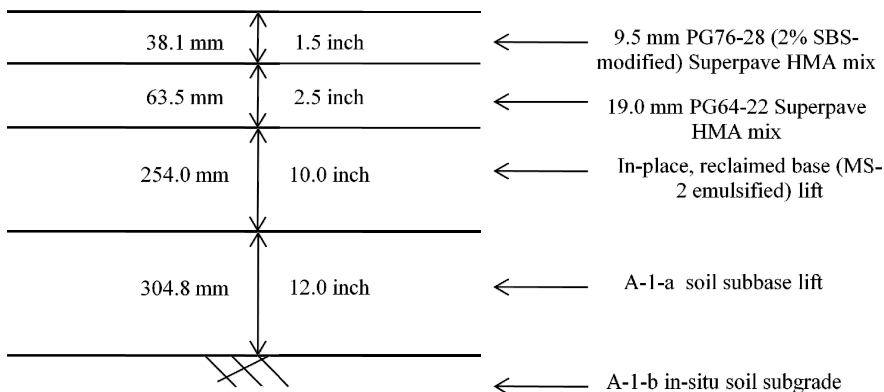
Cross-section of RI-102 reconstruction project (not to scale)
